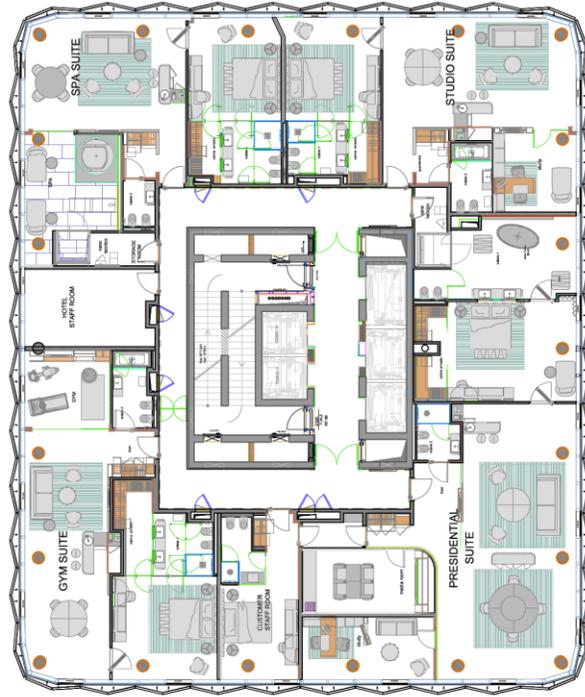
Floor 22- Executive floor layout (Presidential Suite, Gym Suite, Spa Suite, Studio Suite)
